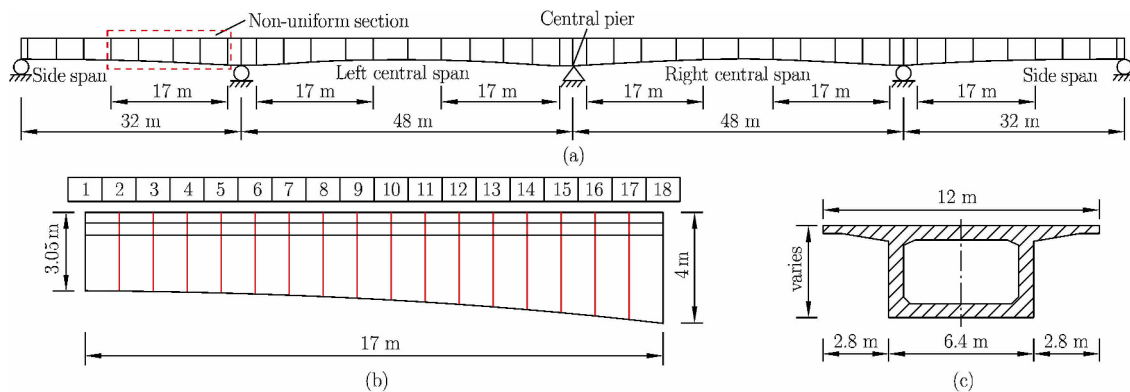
Bridge model: (a) Elevation of the bridge with 42 segments; (b) Numbering of a key section of the non-uniform section; (c) Cross-section.
